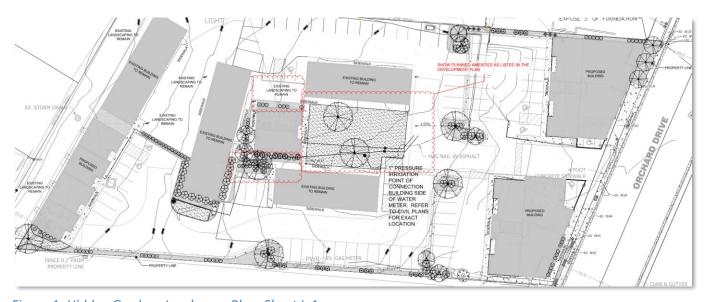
Hidden Gardens Landscape Plan, Sheet L-1
